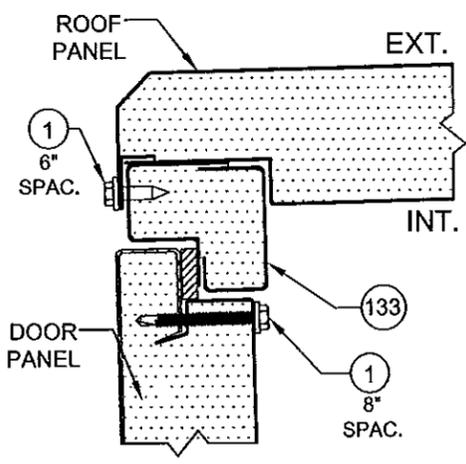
DETAIL A. DOOR HORIZONTAL CROSS-SECTION
